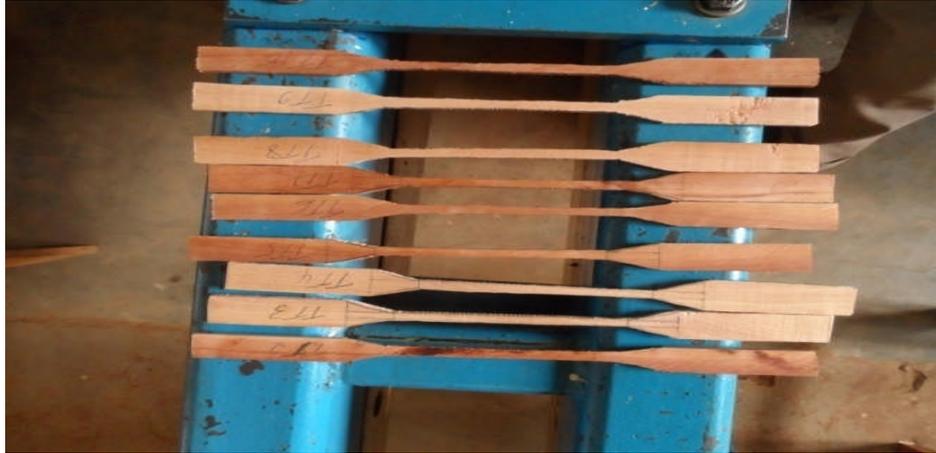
Test Pieces for Tension Parallel to Grain Test
